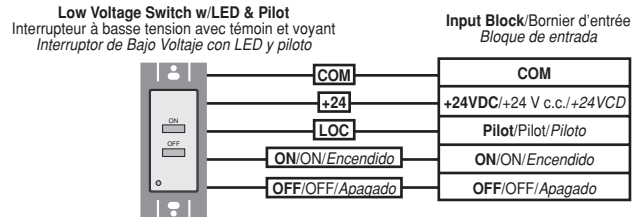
LV Switch 1 Btn Connections / Interrupteurs à basse tension, 1 bouton
